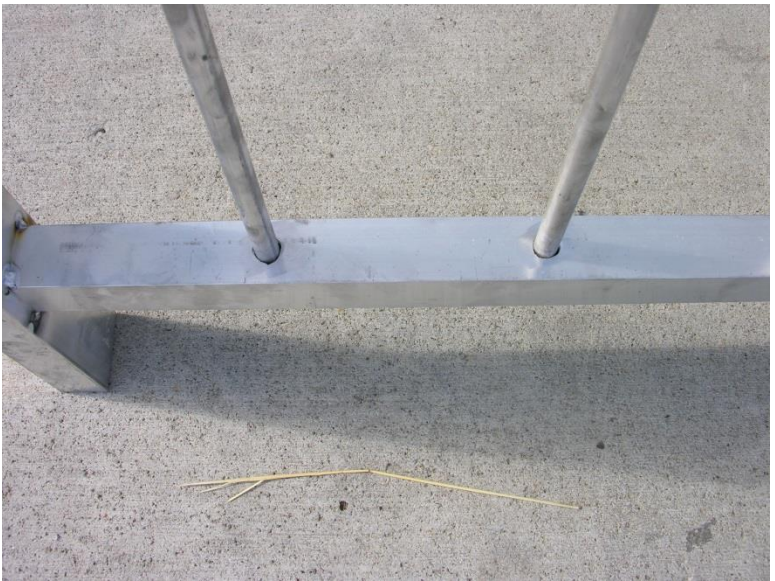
Welded Aluminum Rail, Design Concept AW2
